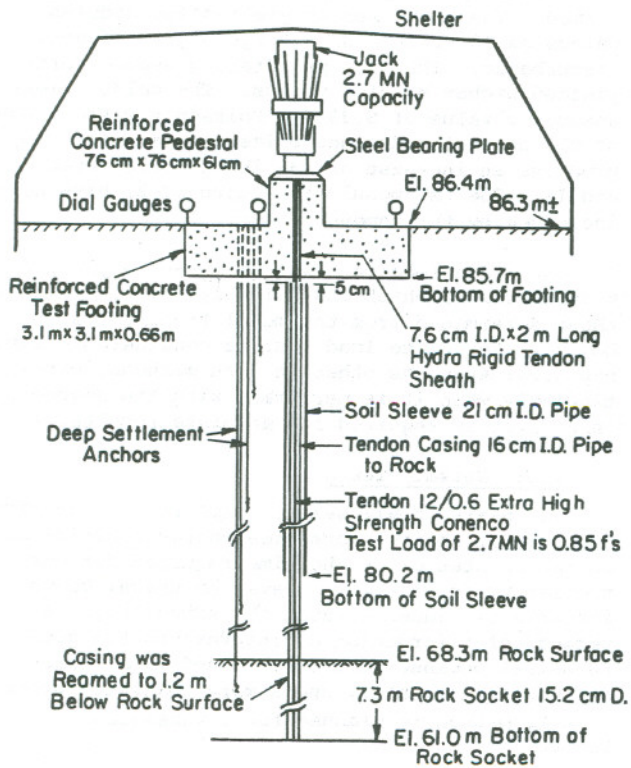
Test arrangement for large scale plate load tests (from Shields and Bauer, 1975)
